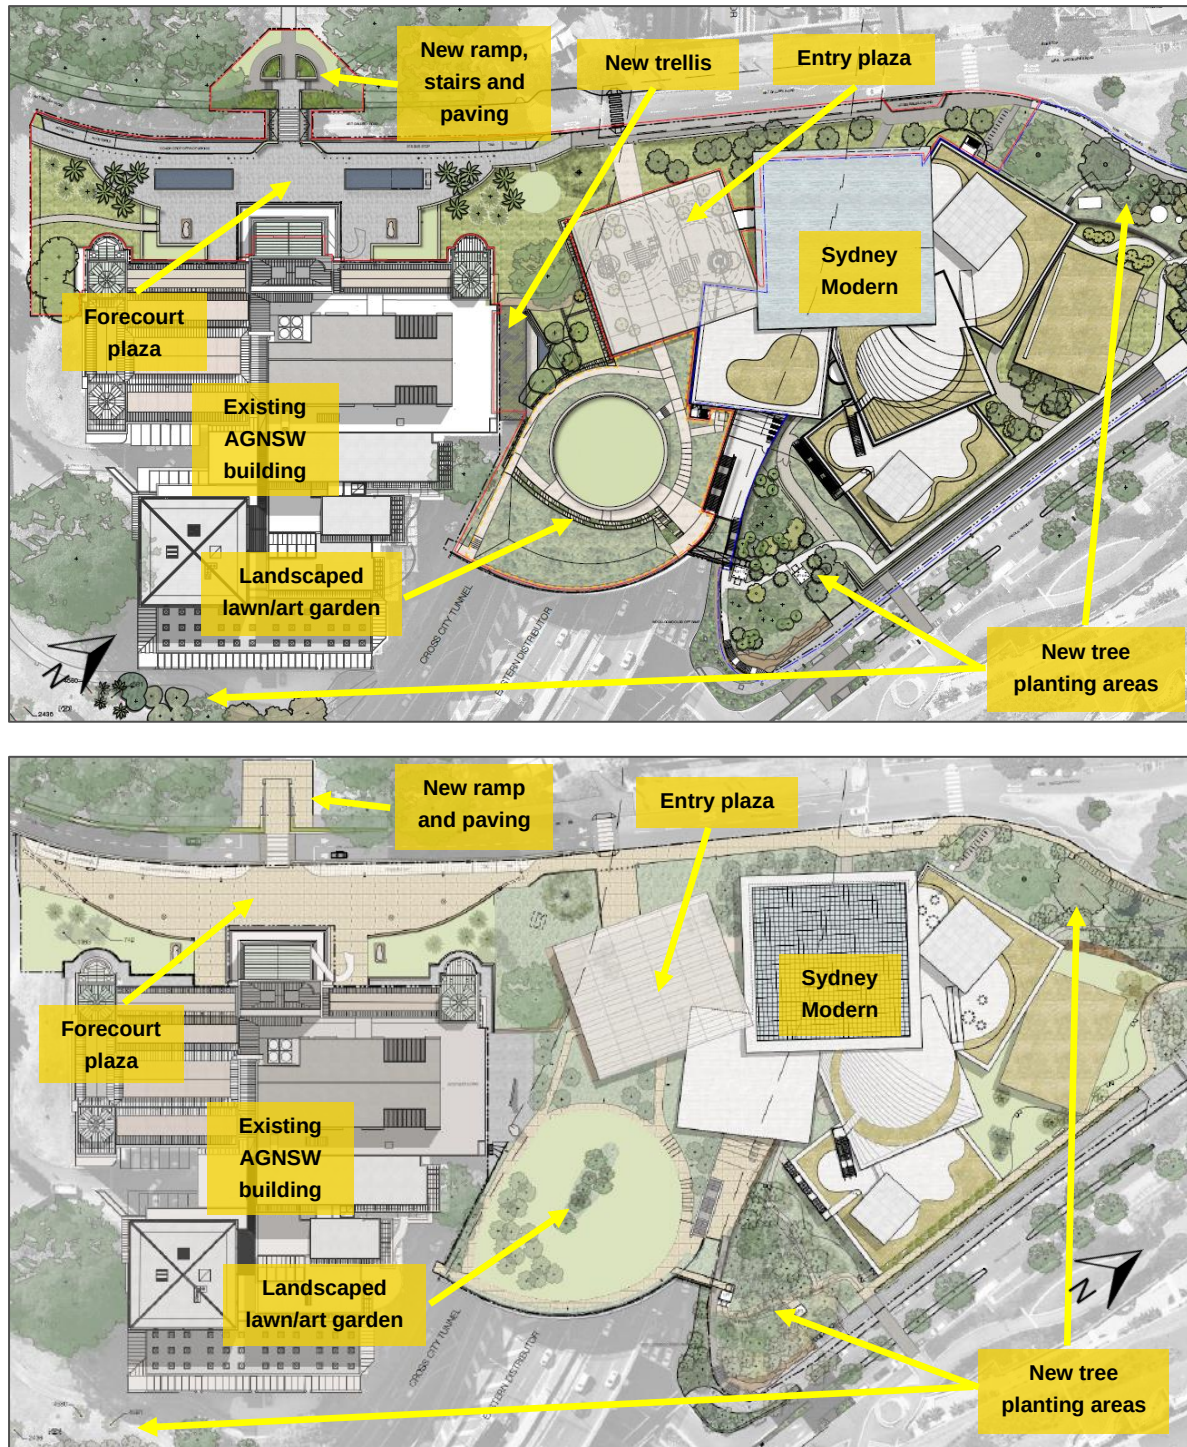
| Plan illustrating proposed landscape design (top) and approved landscape design (bottom) (Base source: Proposed landscape plan and approved landscape plan)
